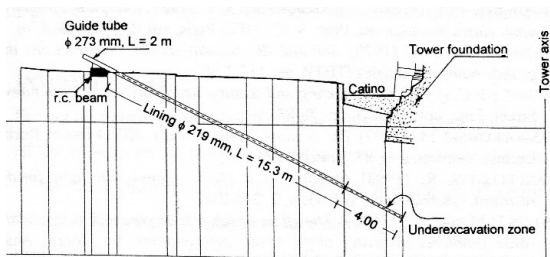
Preliminary underexcavation experiment beneath the tower: cross section
